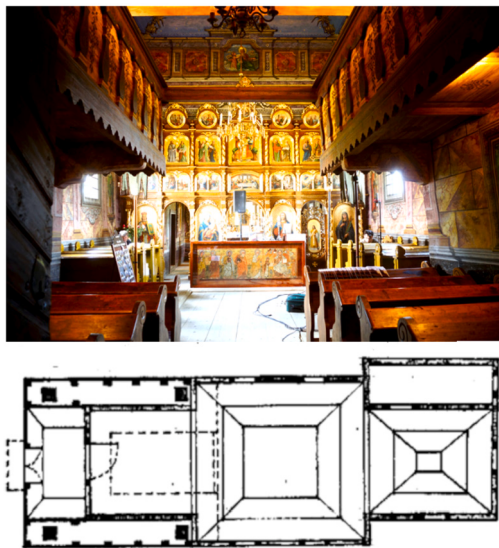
Interior photograph and floor plan of St. Paraskeva Church in Kwiaton.
